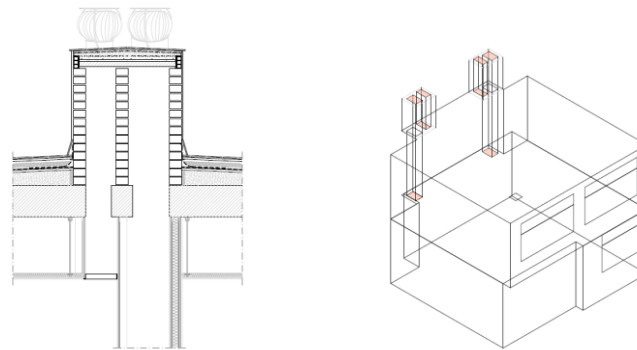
Standard classroom NVS details: left) section and right) axonometric view
